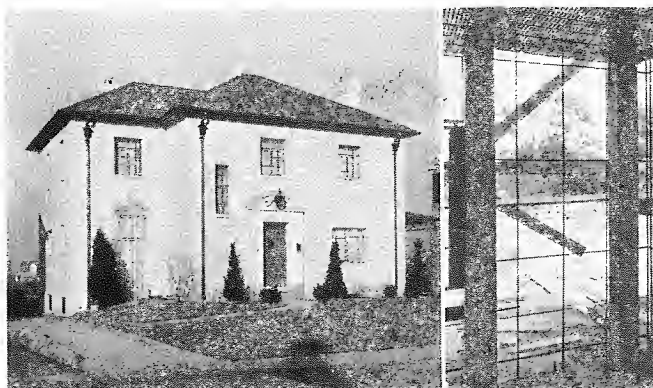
A and B. Modern House with Metal Lath Used in Combination with Reinforced Concrete Structural Frame.
